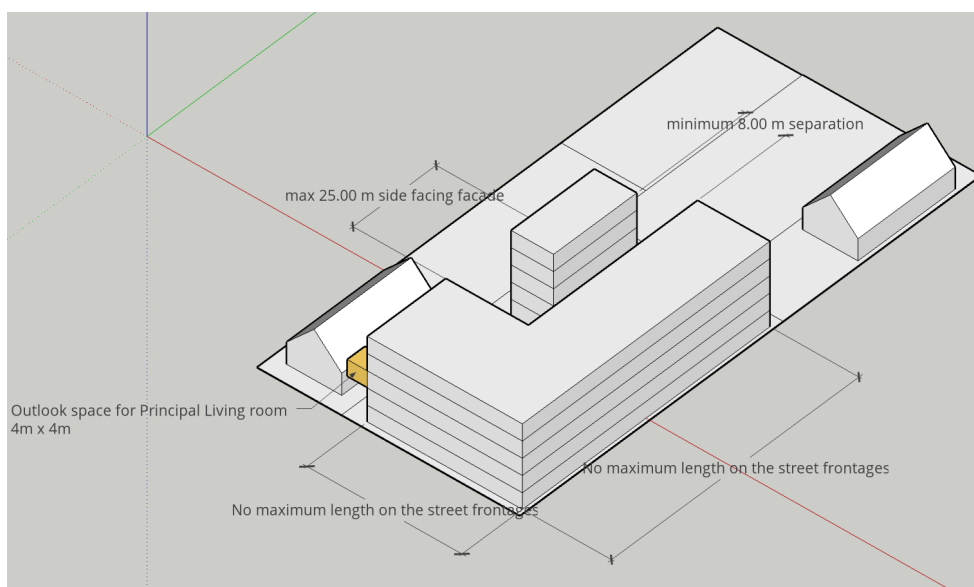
Showing a corner block site development scenario complying with CCZ-S11, CCZ-S12 and CCZ-S13 based on the proposed amendment above to increase outlook space to 4m x 4m for principal living rooms.
